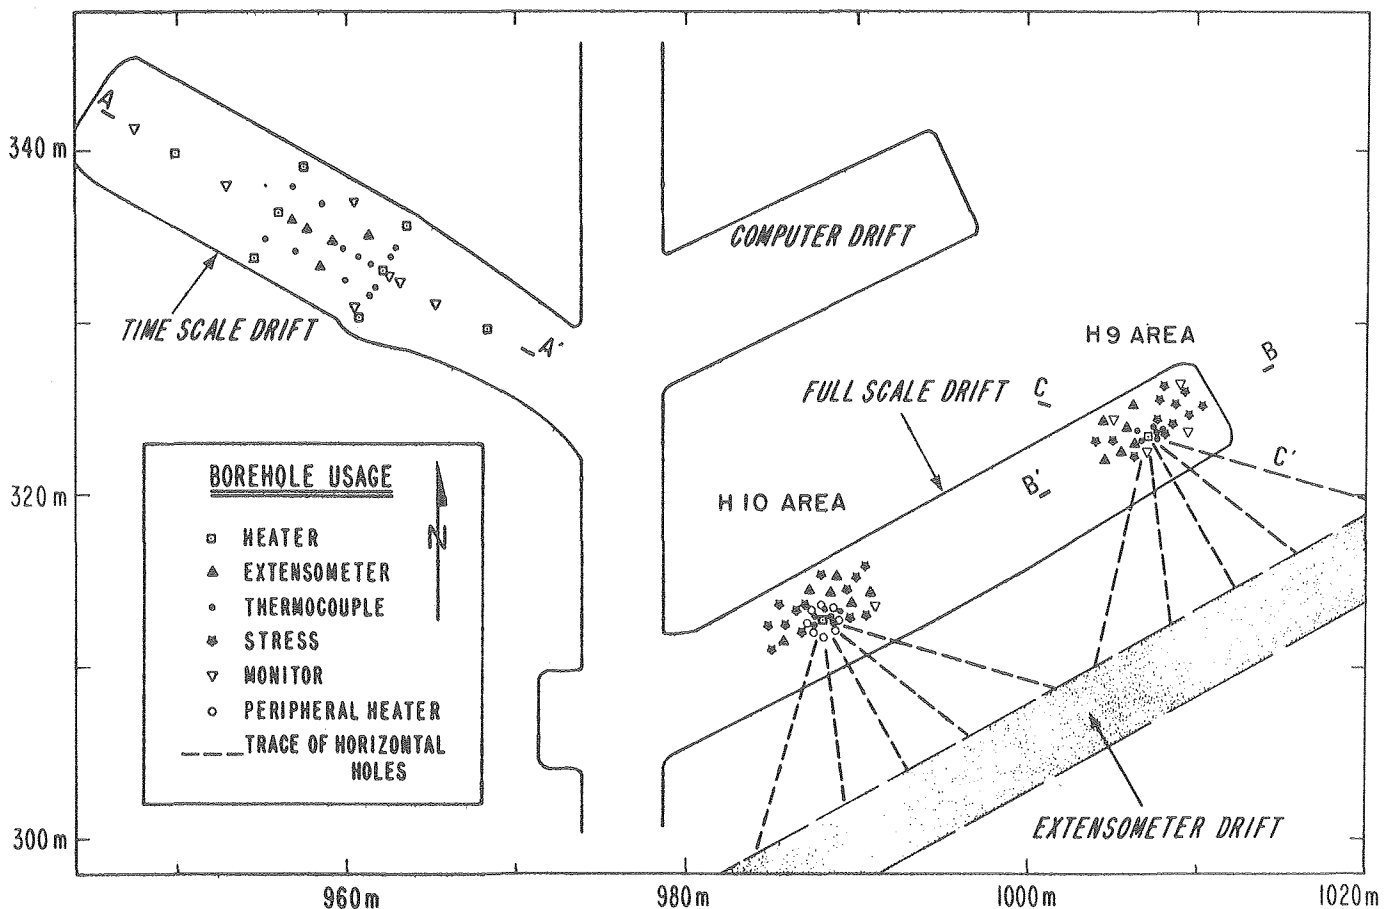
Plan view of experiment area 340 m underground, showing locations of heater and instrument boreholes.
